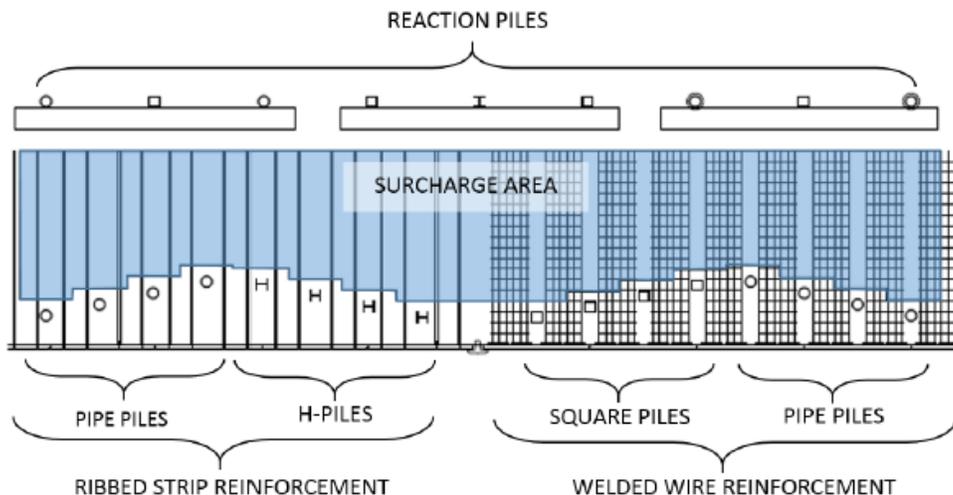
Plan view of the MSEW for Phase 1 test loads (Luna, 2016)
